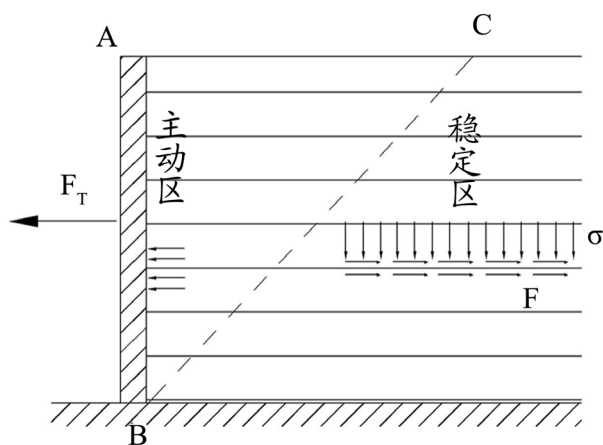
Schematic diagram of friction reinforcement in retaining wall
